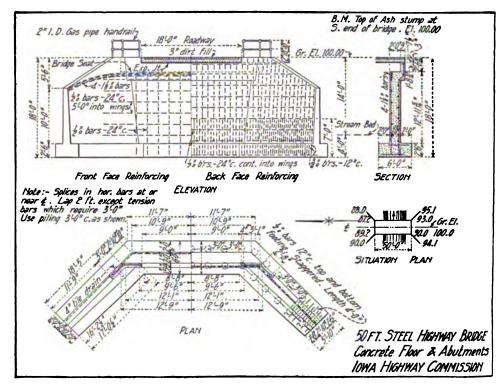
REINFORCED CONCRETE HIGHWAY BRIDGE ABUTMENTS. IOWA HIGHWAY COMMISSION.
